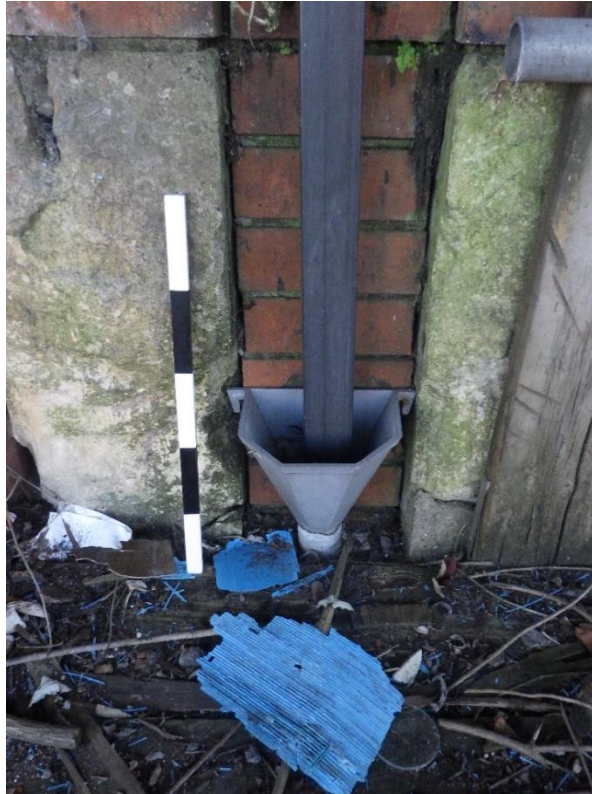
Detail shot of fall pipe feeding into hopper added as a later addition, looking east (0.50m scale).
